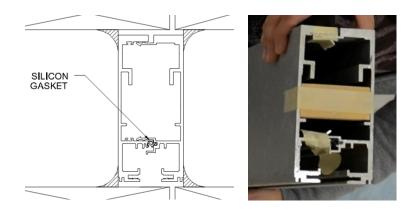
MULLION CONSTANT 1 (MC1) SHOWN IN PLAN (LEFT) AND SPECIMEN PHOTO (RIGHT)
